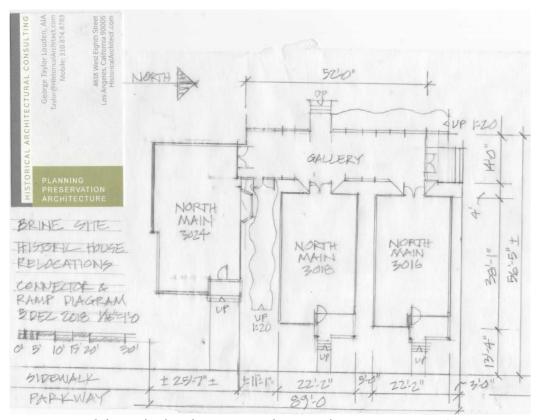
Schematic site plan, proposed connecting structure, 12-05-2018
